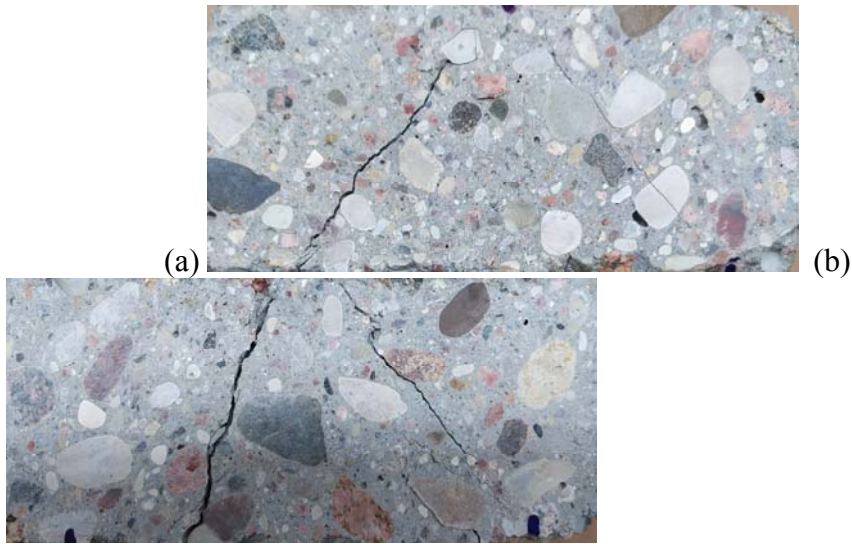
Crack patterns on the surface of concrete beams reinforced with steel bars:
